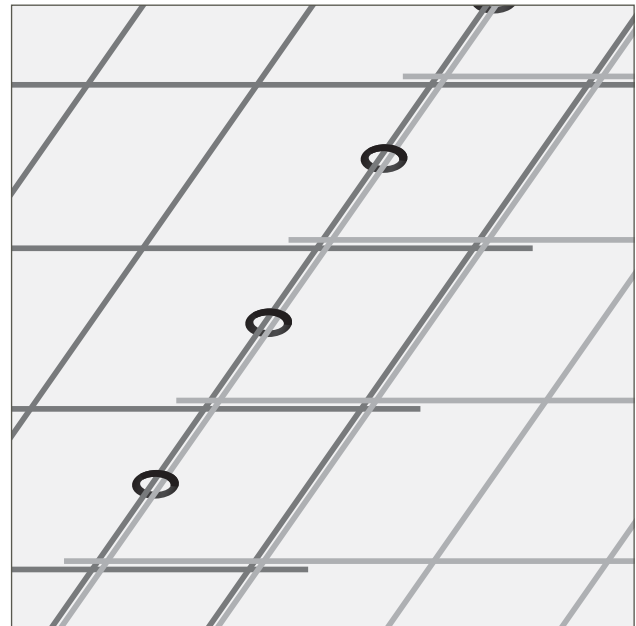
Overlapping of adjacent runs of mesh by one opening width. Steel staples are required to fix runs of mesh where purlin spacing exceeds 1.7 metres.
